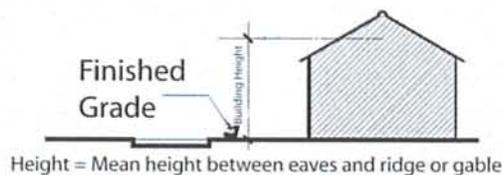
This illustration shows the appropriate way to measure building height for both pitched and flat roofed structures.
